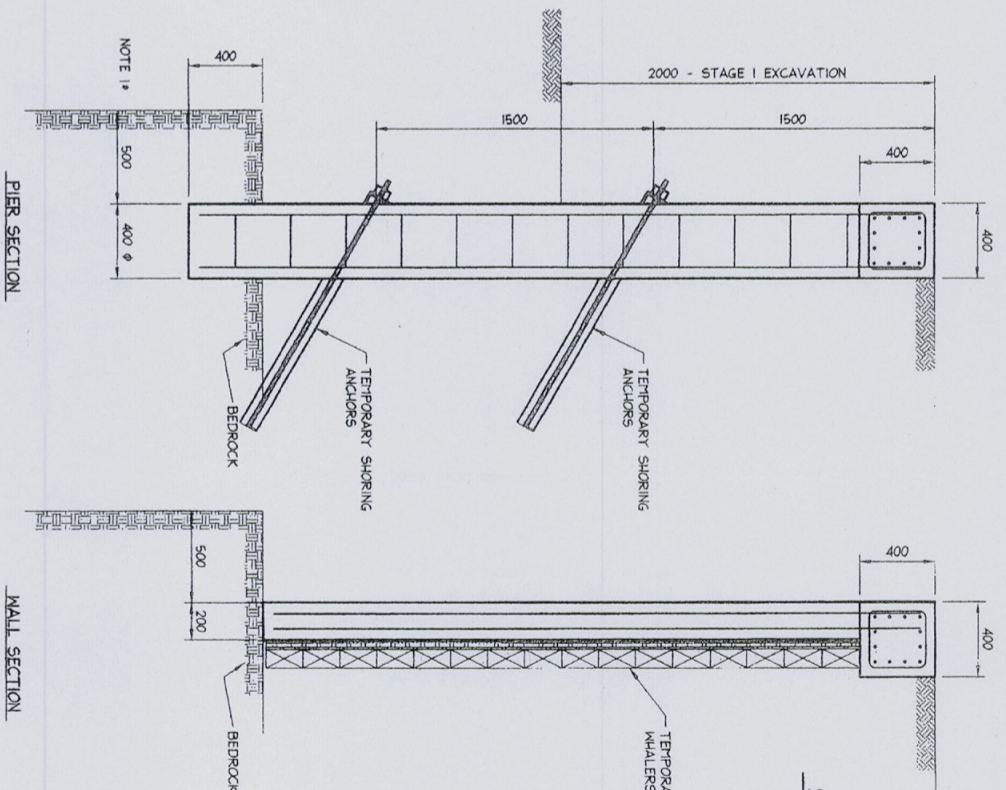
DETAIL OF SHORING WALL MAY VARY TO SUIT SITE CONDITIONS
